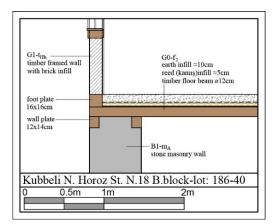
Connection detail 2, section drawing of floor beams located on the wall plate of masonry wall and foot plate located on the floor beams (Kubbeli N. b.block-lot:186-40)
